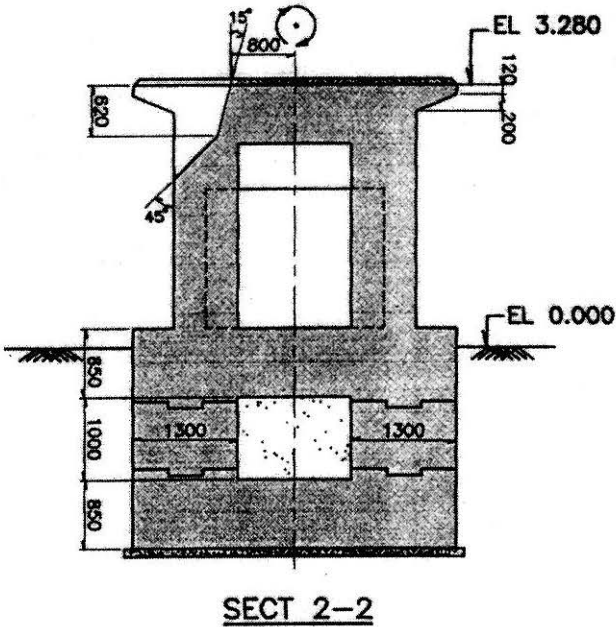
Transverse Section of I.D. Fan Foundation
